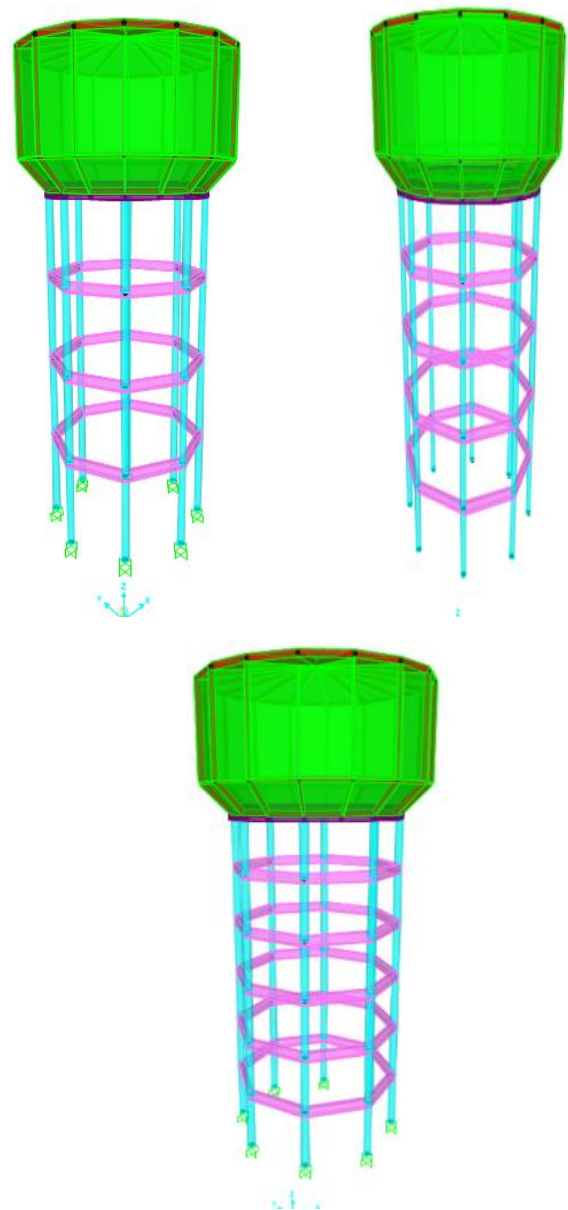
3D modeling of elevated water tank with different staging height in SAP2000
